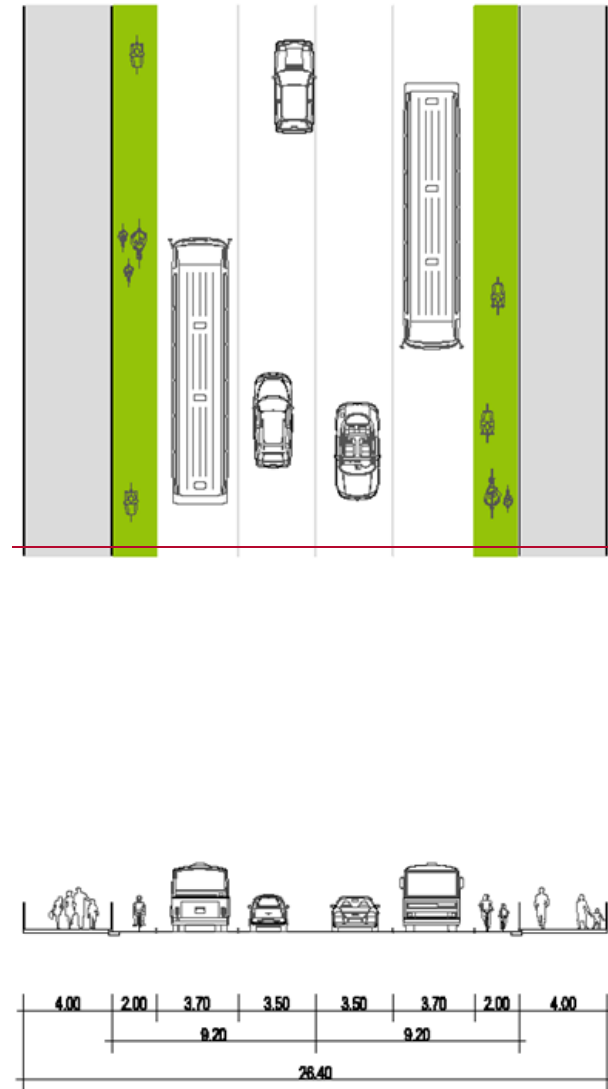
C ~~Sub-arterial road type a typical cross section~~
